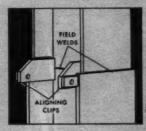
Column Splice designed to facilitate simple field welding in downhand position. HERE IS PROOF
